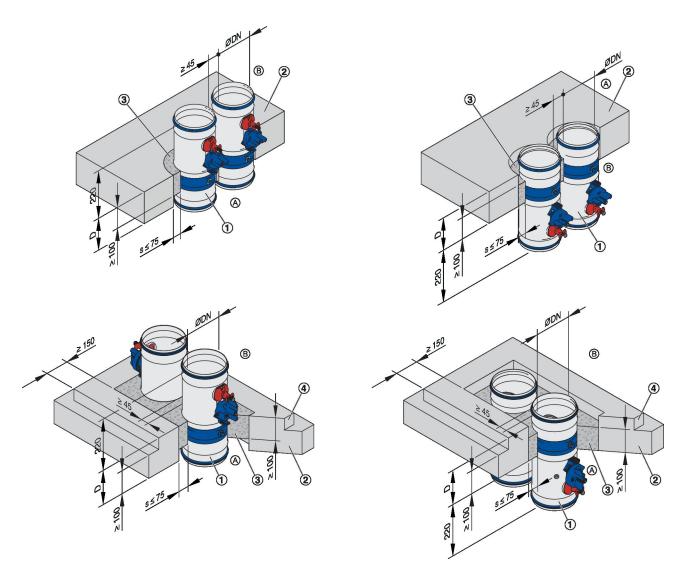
Mortar-based installation into solid ceiling slab, suspended or upright, two fire dampers side by side
